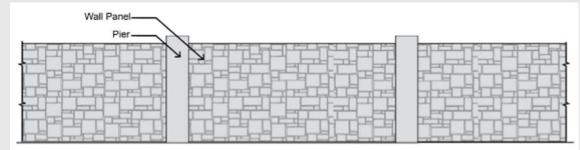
Elevation of Typical Noise Barrier/Sound Wall
